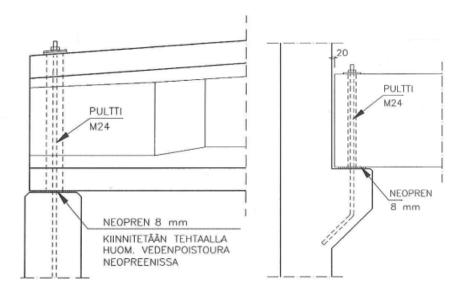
Examples of easy dismantled connections in concrete structures (Building industry 1995).
